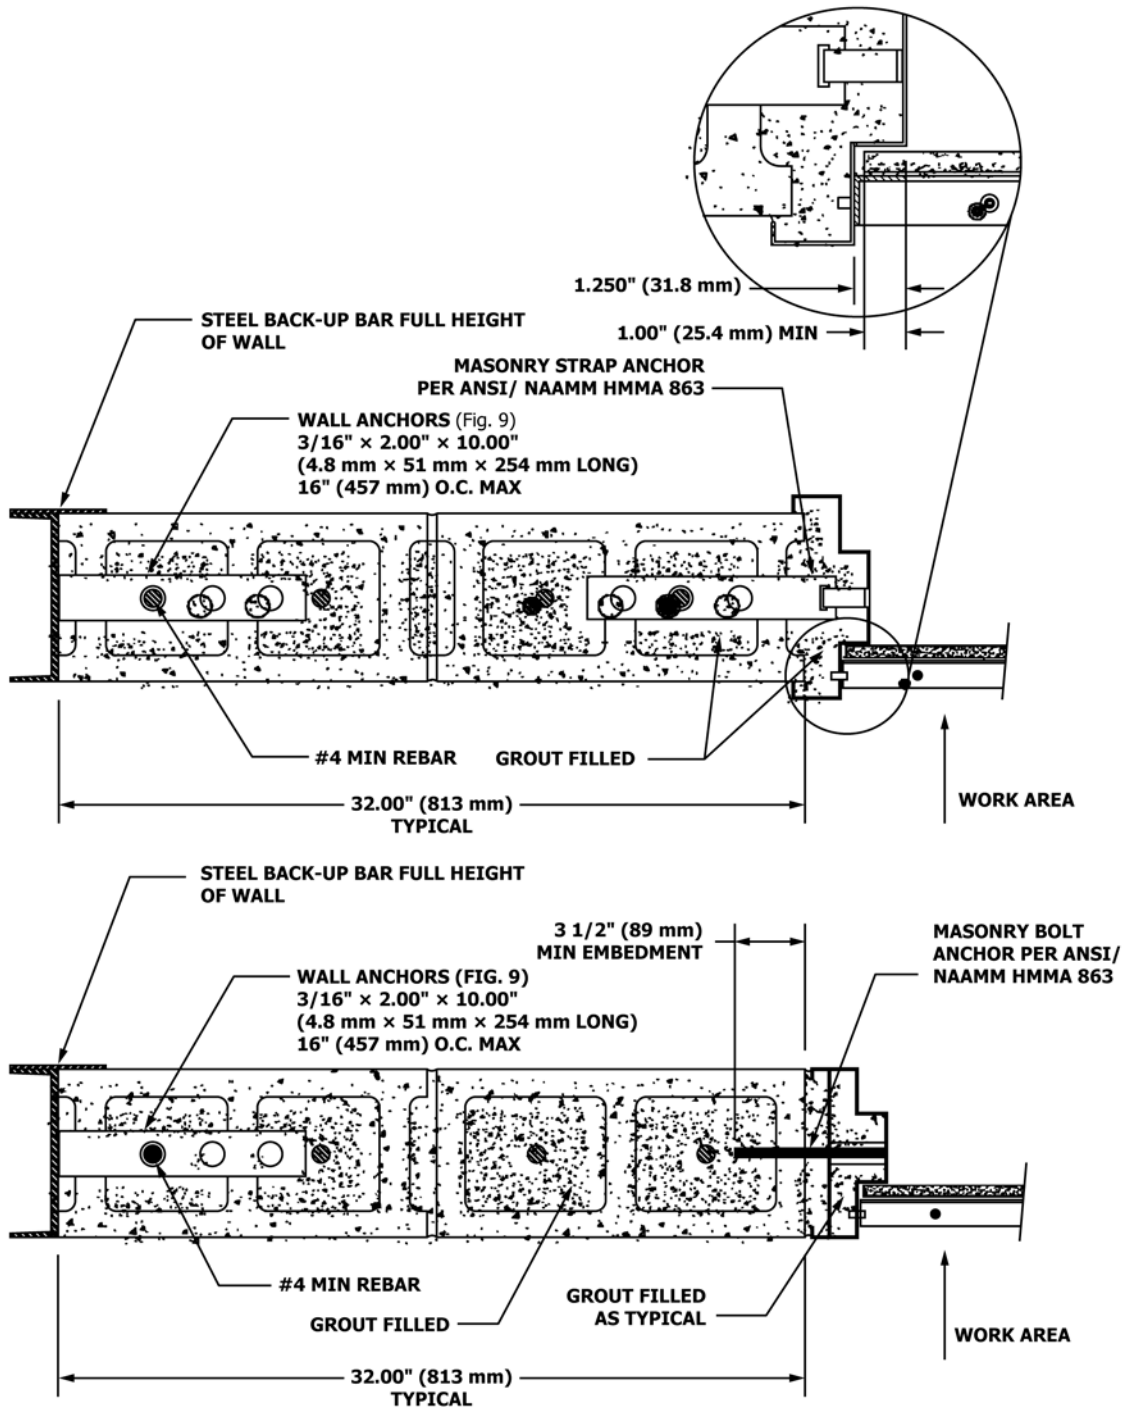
Section A-A HHMA 863 Type Masonry/Concrete Anchors
